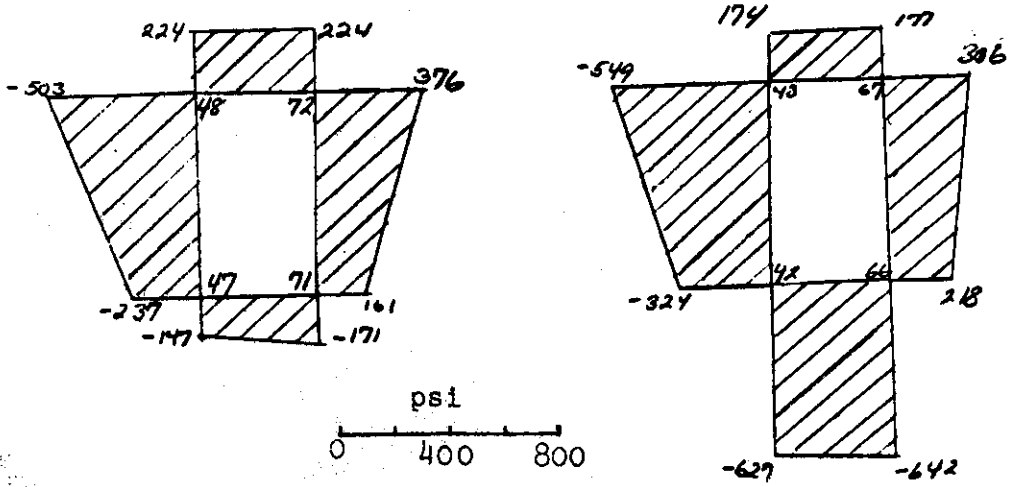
Shear Stresses At Sections Of The Transverse Box Girder Section III (Model Results)
